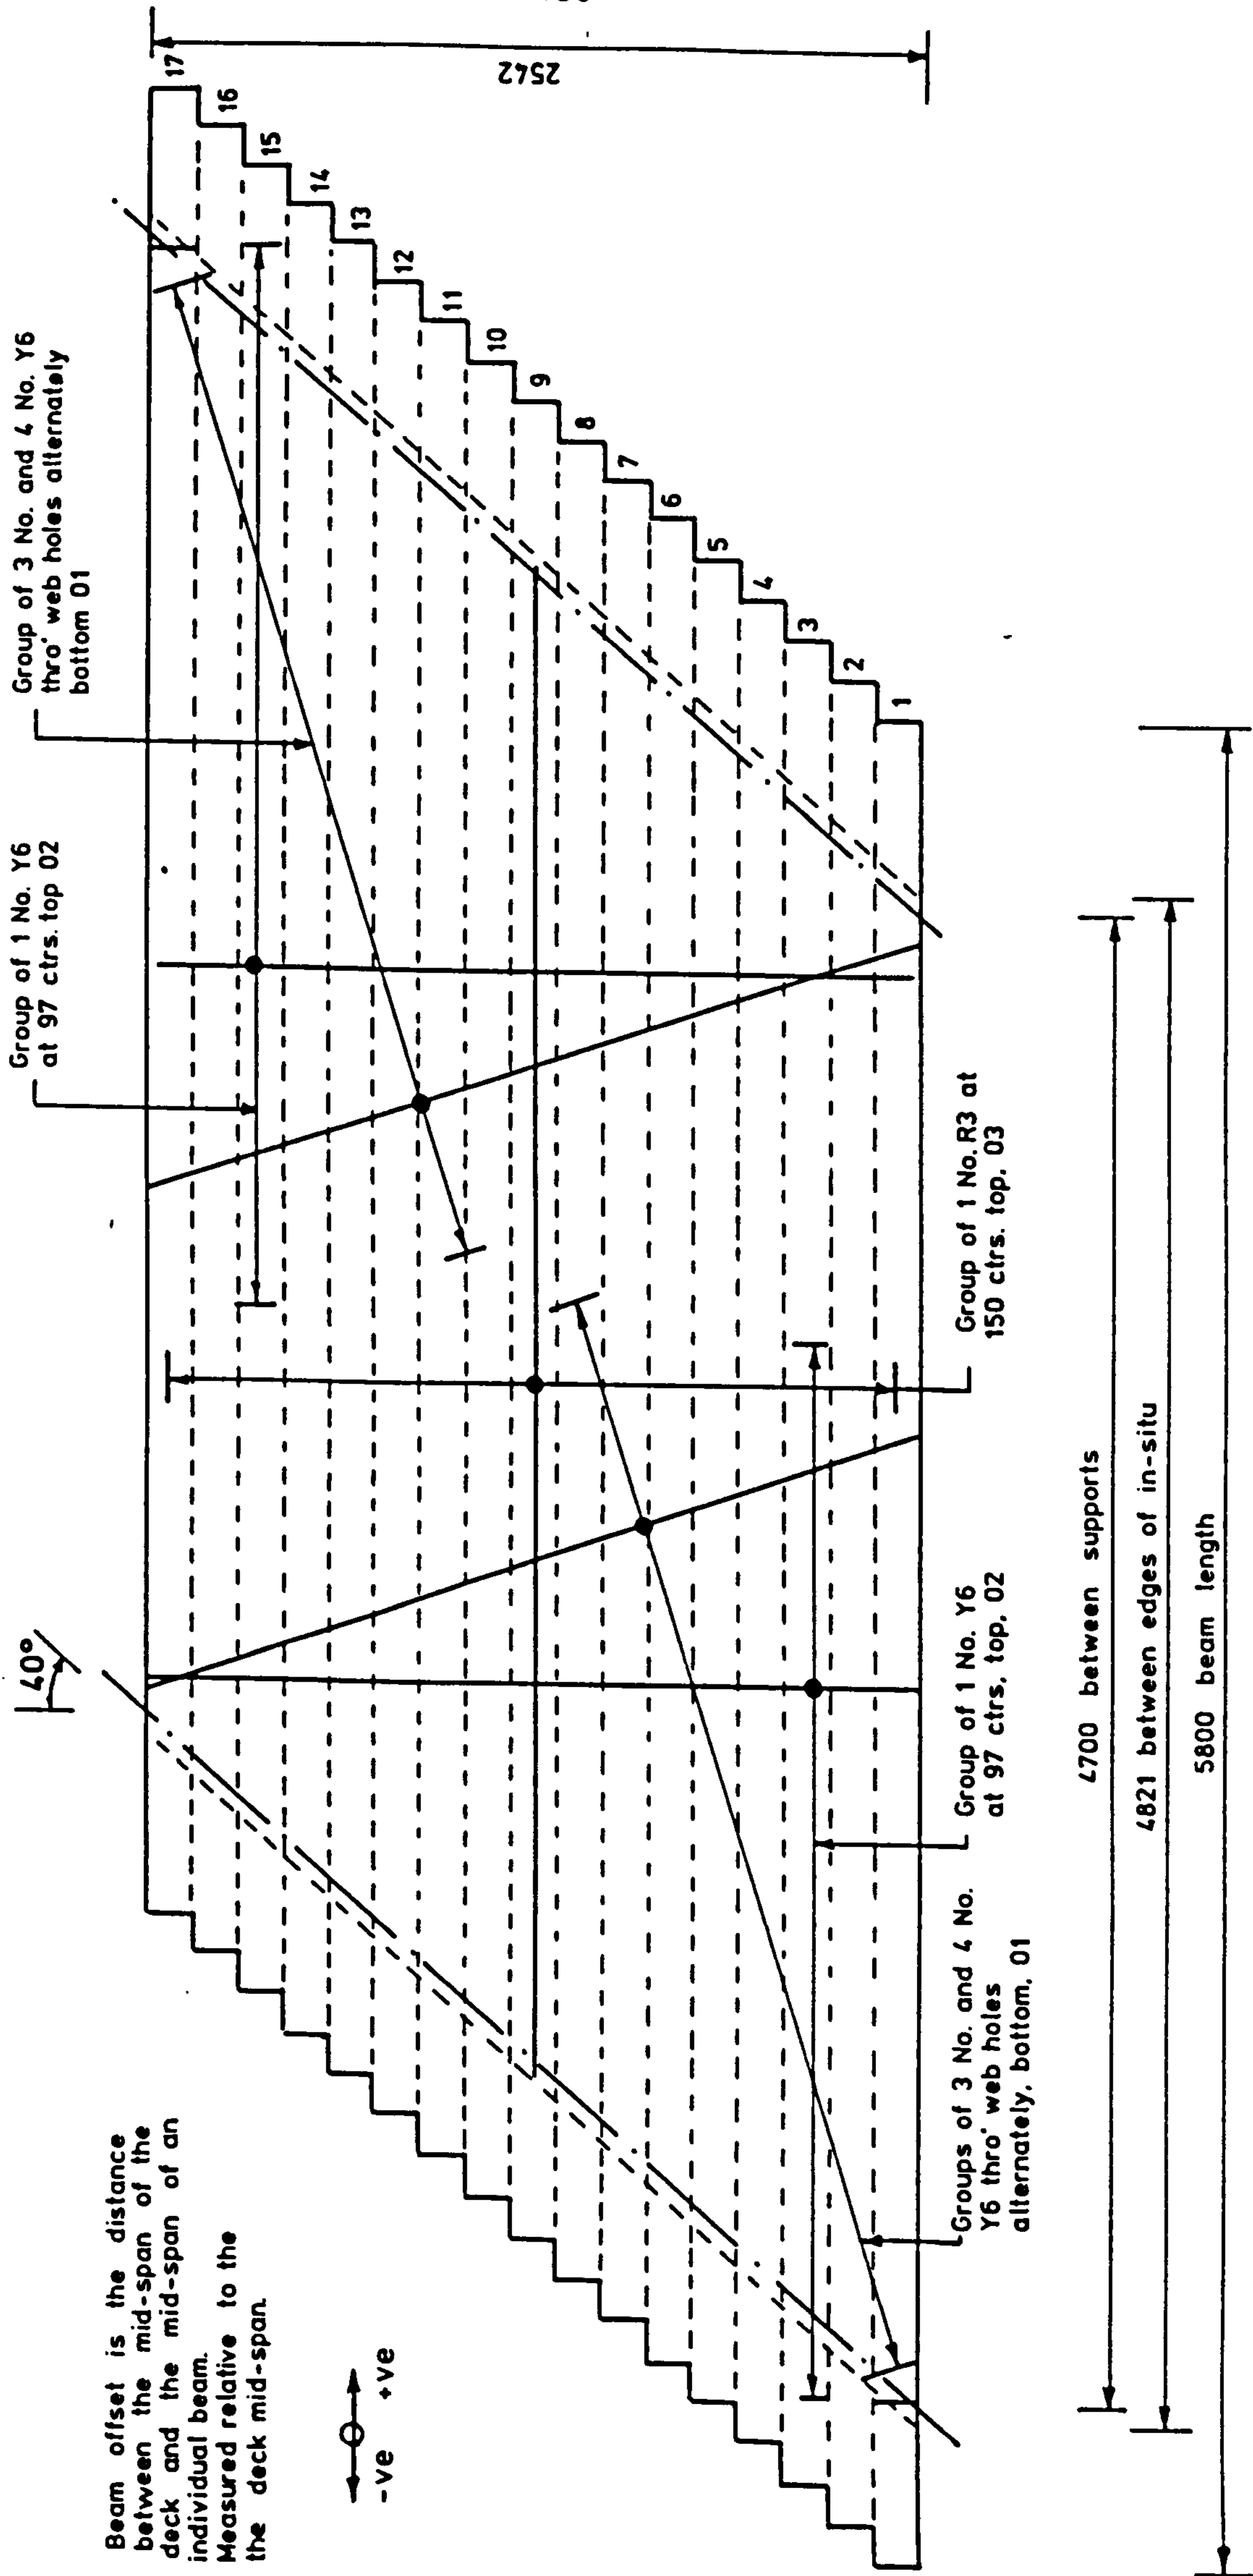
REINFORCEMENT LAYOUT FOR MODEL DECK 2
